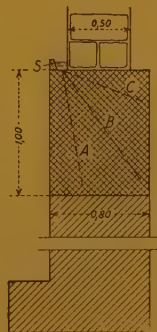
Underpinning a wall at the Ministry of Colonies in Paris.
